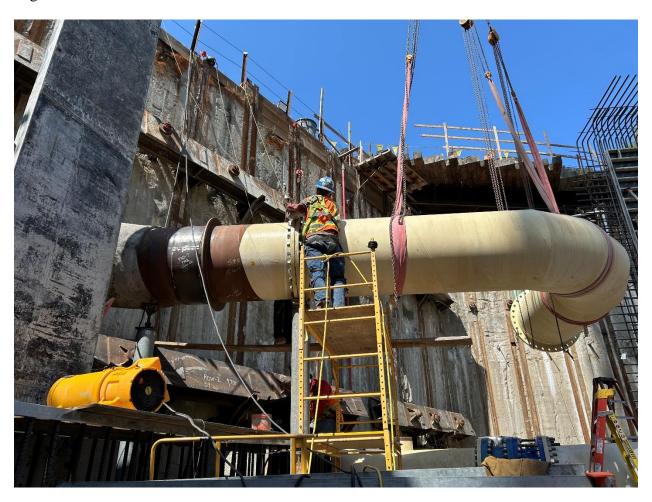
Pipefitter positioning the 36-inch wasteway piping within the valve vault of the UV-CCB Facility with the aid of the tower crane.
